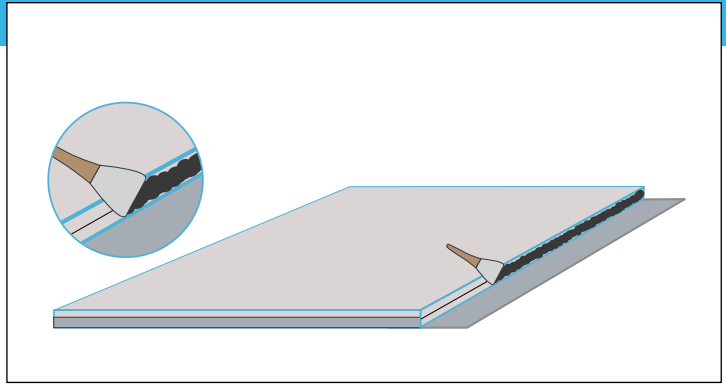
Application of QuietSeam® RF to cut edge of panel
